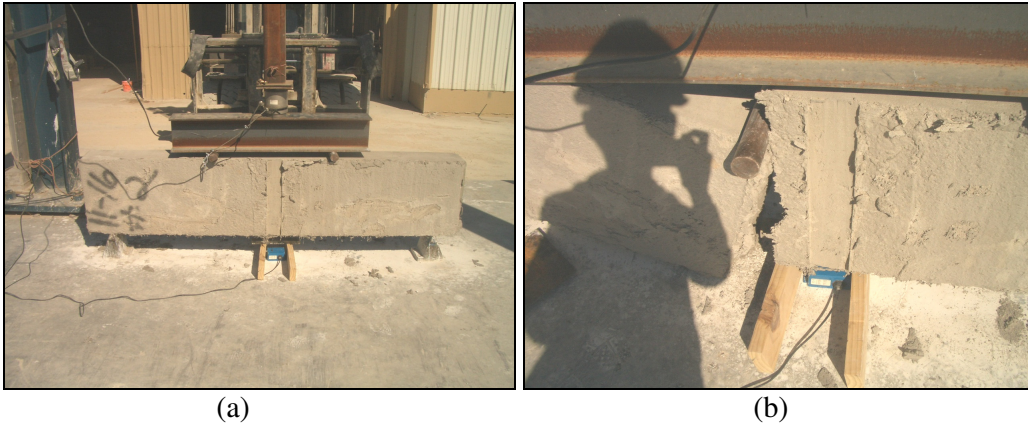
Beam for 2<sup>nd</sup> batch concrete cast on 11/16/06 for 90 day test;
